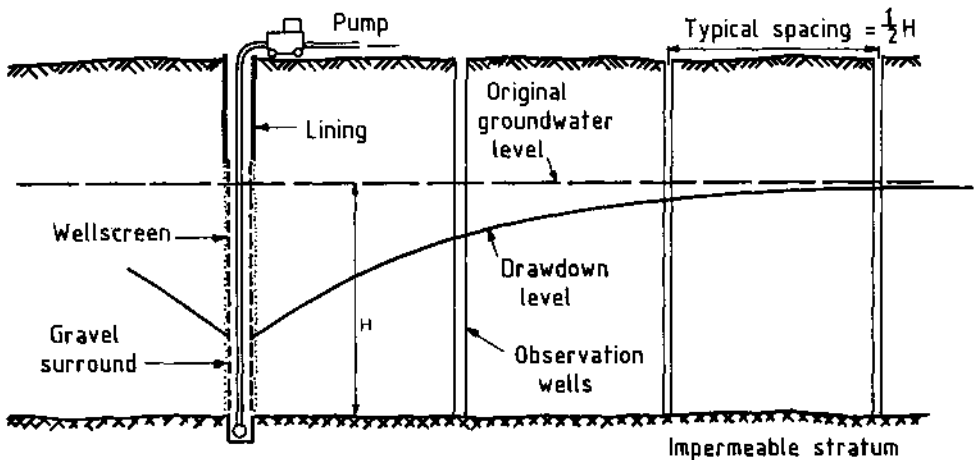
Typical arrangement for a well pumping test with observation wells.
